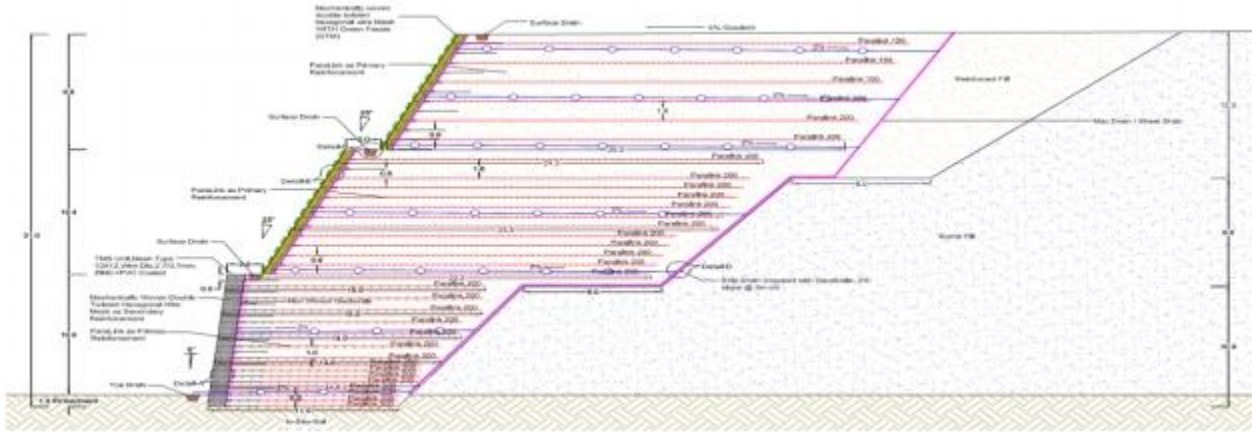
Typical cross-sectional reinforcement details of 31.0 m high OB Dump Structure
